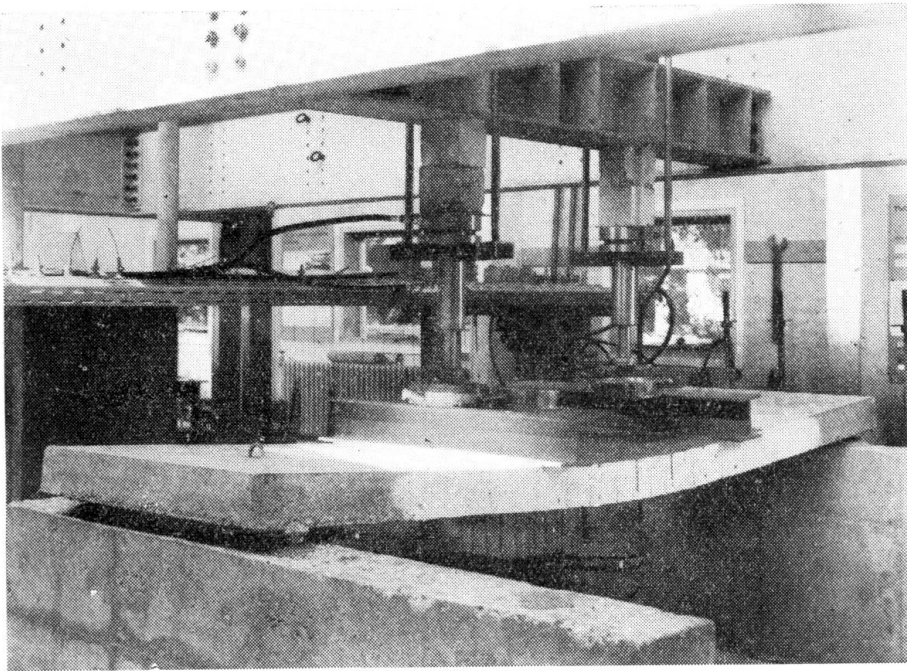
Condition at maximum load of a slab with six Tentor bars
